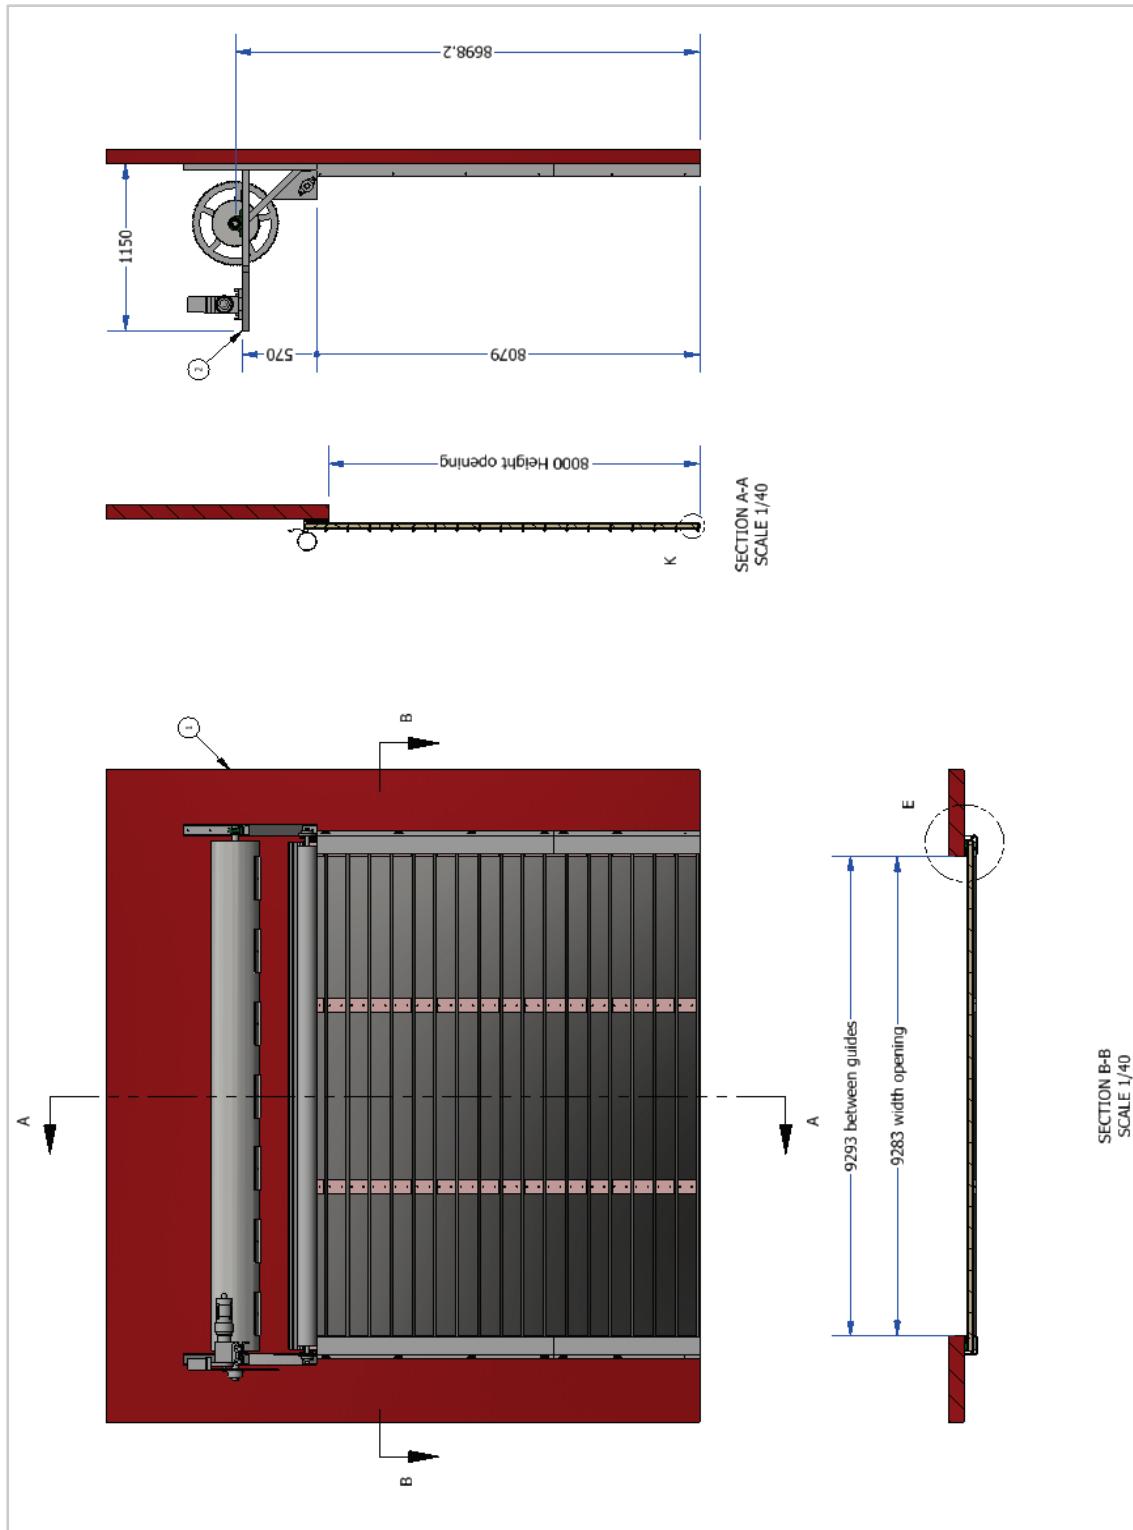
Overview of the rolling shutter assembly and the upscaled dimensions
